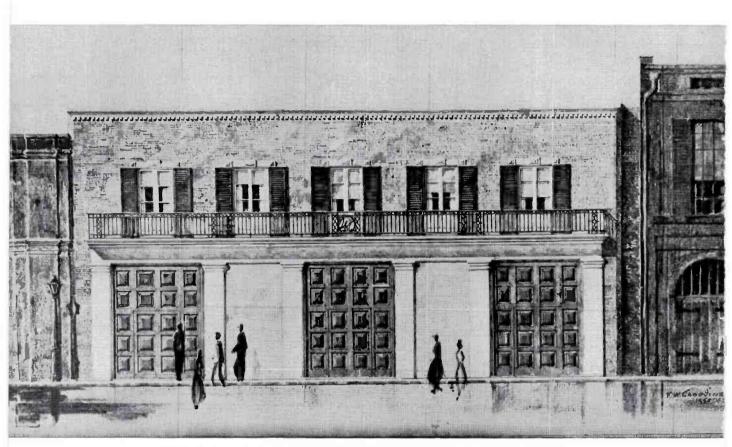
(above). Artist's drawing showing the facade of the new WDSU/WDSU-TV studio building.
